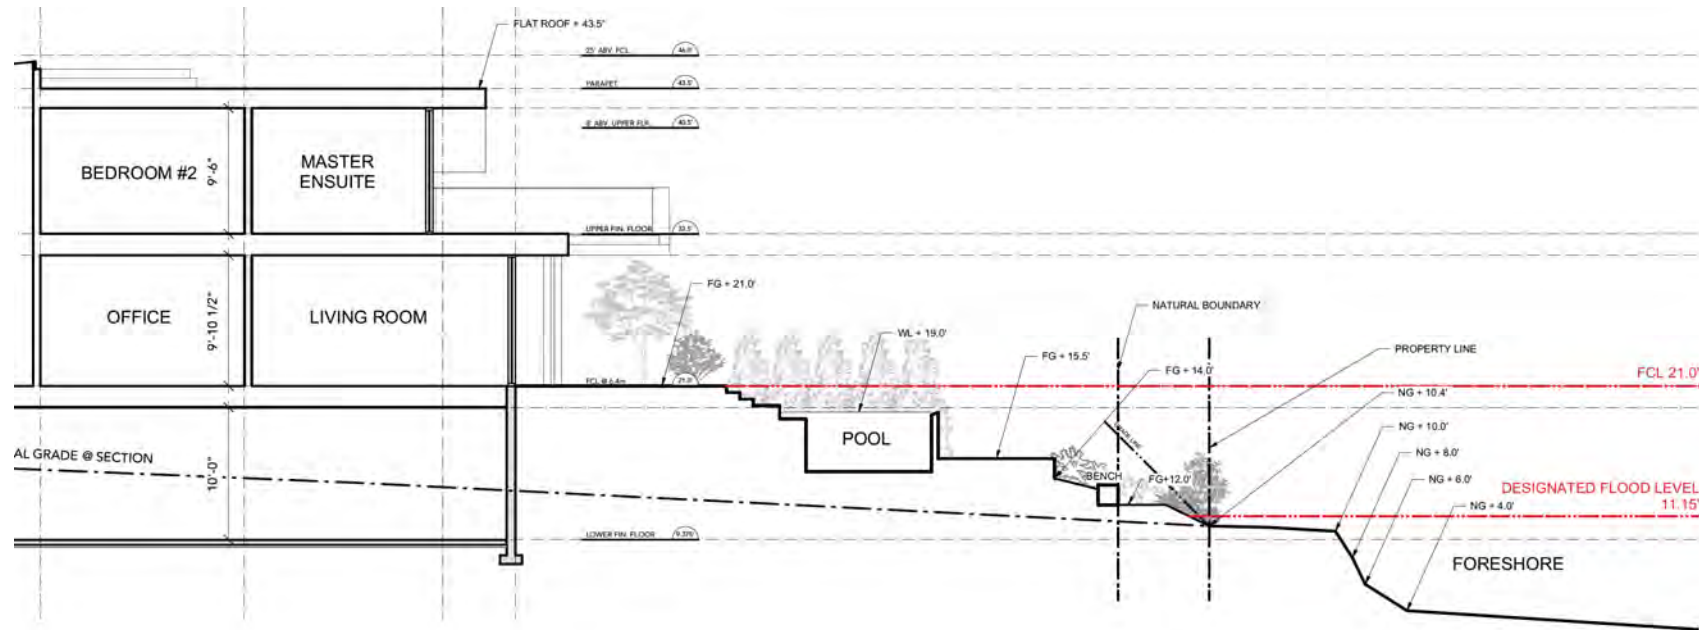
Section of the proposed development and the upper foreshore (Lamoureux Architects)
